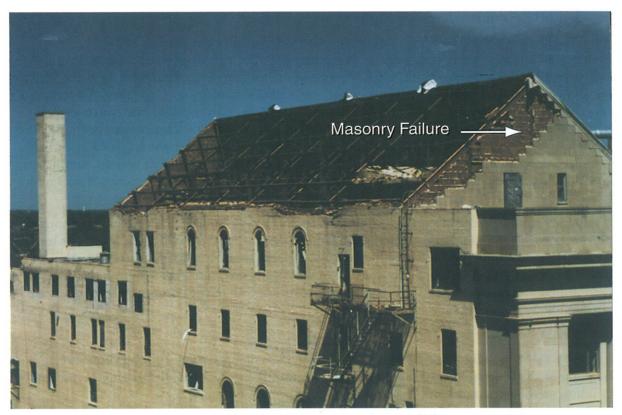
Journal Record building – damage to roof on south side and masonry failure on east side.
